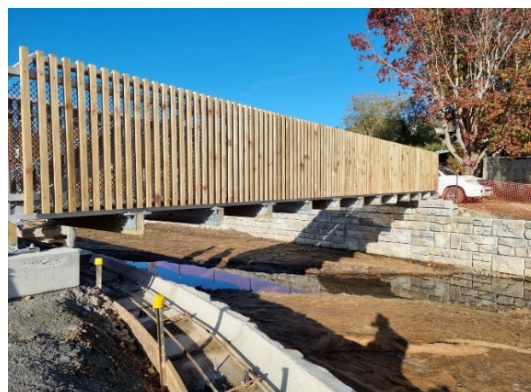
Pedestrian bridge installed on concrete foundations (photo credit: GHD)
